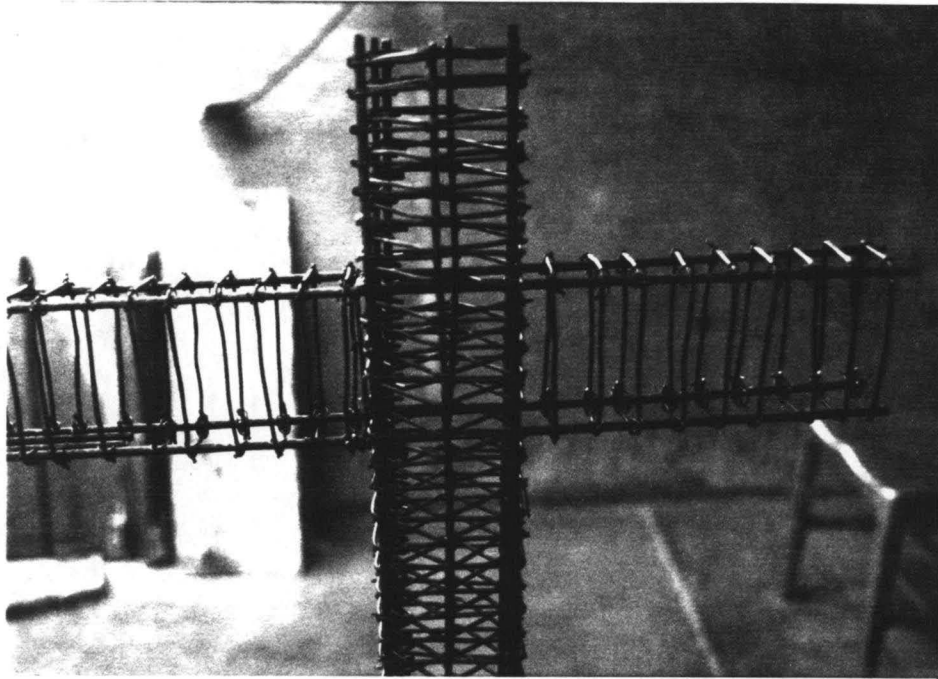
Reinforcement of Beam-Edge Column Joint Region in Shear Wall
